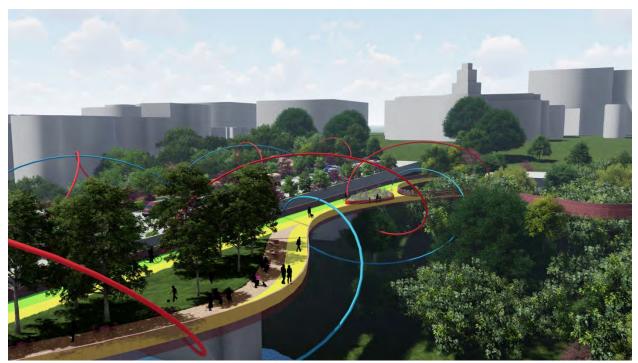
North Main Street Bridge Enhancement - Open Lawn and Seating (Adapted with Lumion)
